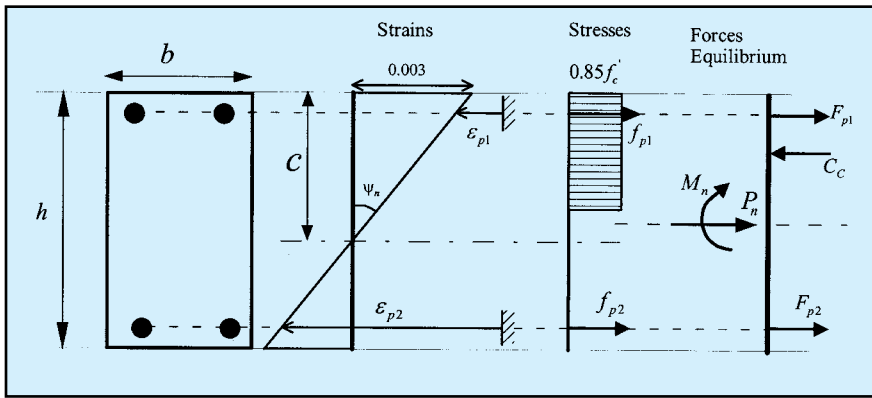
Sectional analysis of prestressed concrete column based on compatibility and equilibrium requirements.
